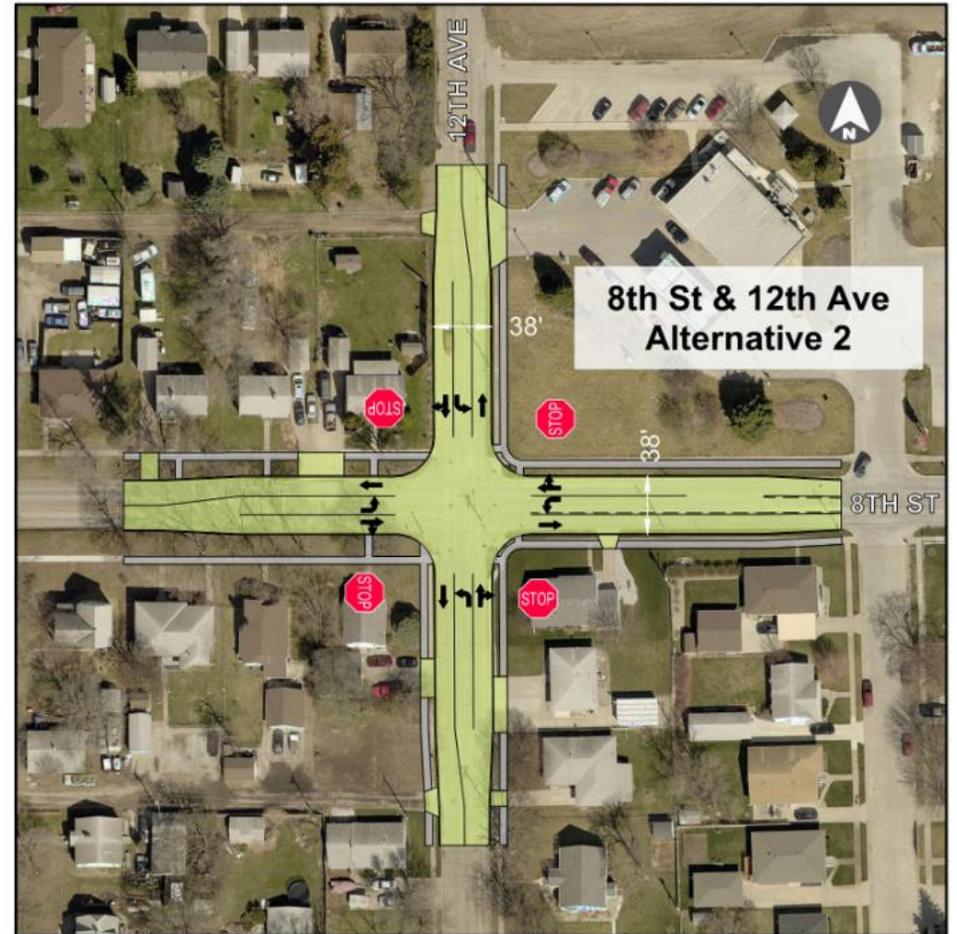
Alternative 2 – 12th Avenue & 8th Street
